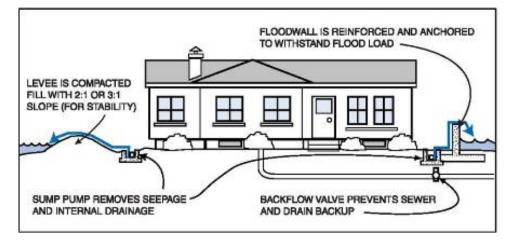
Structure protected by levee (on left) and floodwall (on right)
